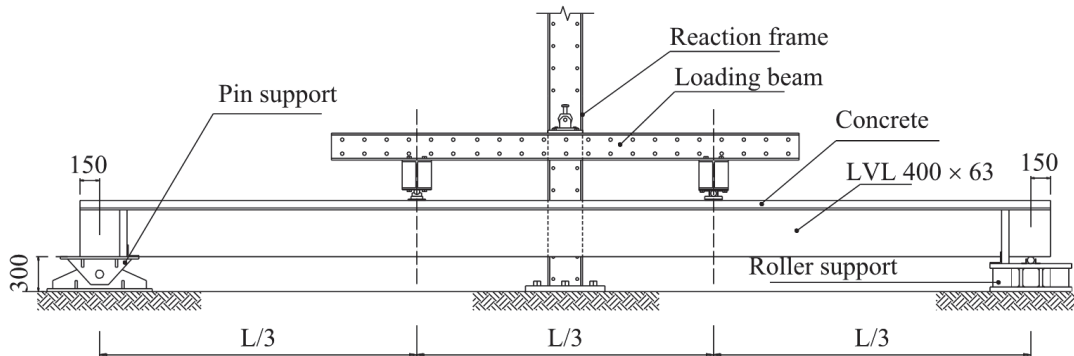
Four-point bending test of a TCC beam (dimensions in mm)[14].
